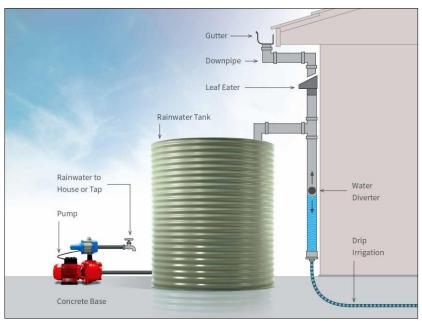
An example of a stormwater gutter, rainfall harvesting system
